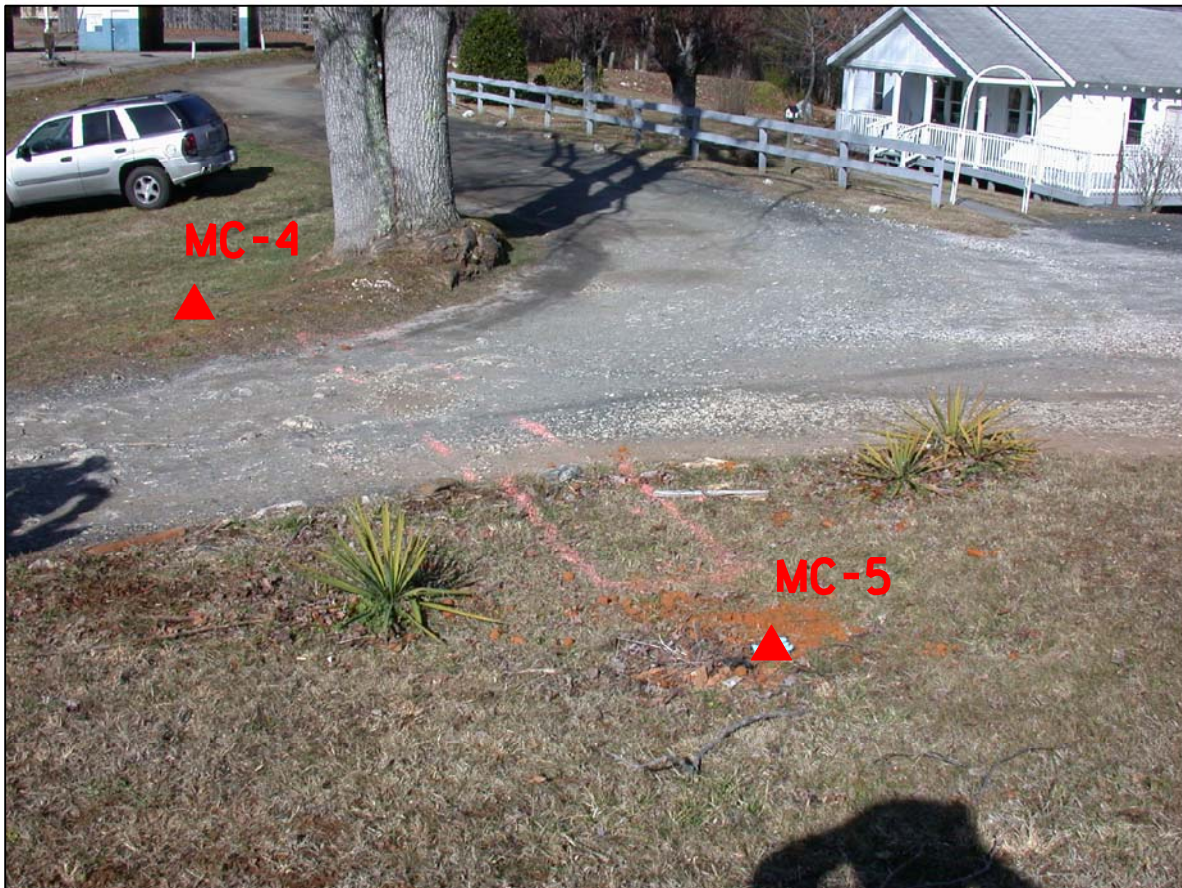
BORINGS IN RIGHT-OF-WAY AT ANOMALY LOOKING WEST
